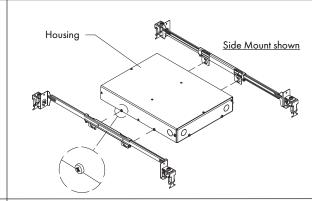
Attach T-Grid Clip assemblies to Hanger Bracket Assemblies
